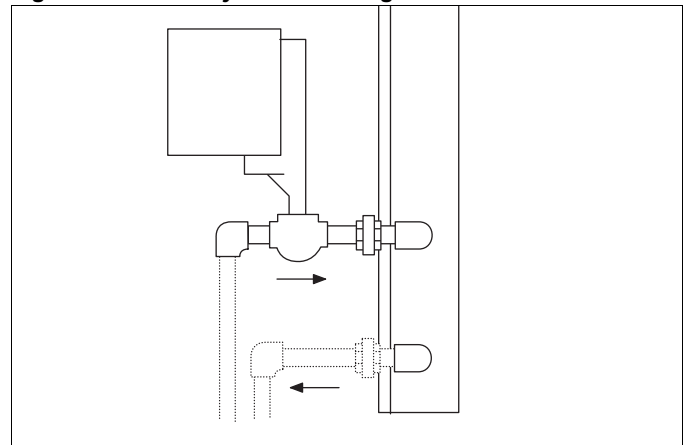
Steam Heat Section (Shown with Factory Valve and Piping)
